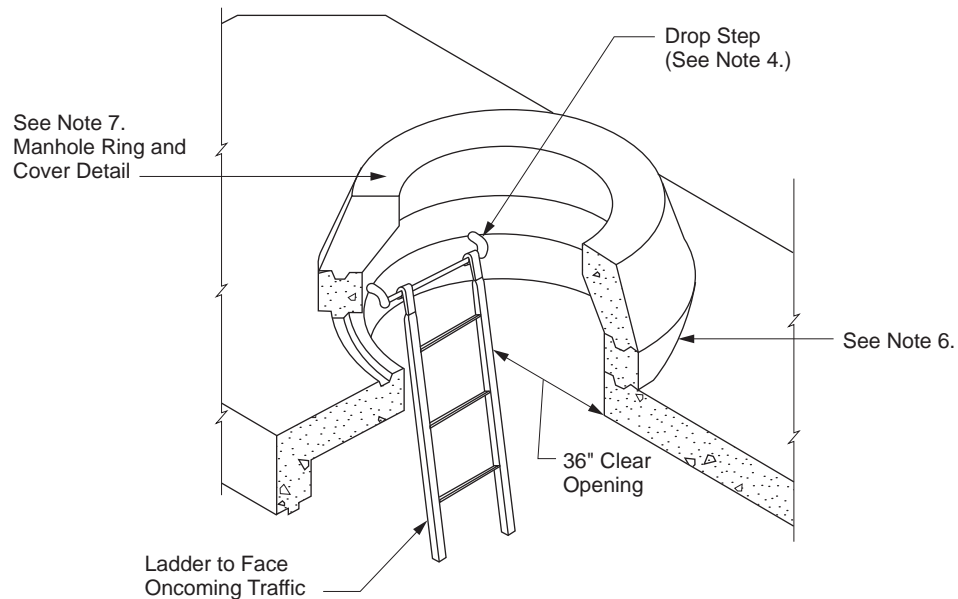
Ladder Mounted Detail for Precast Manholes
